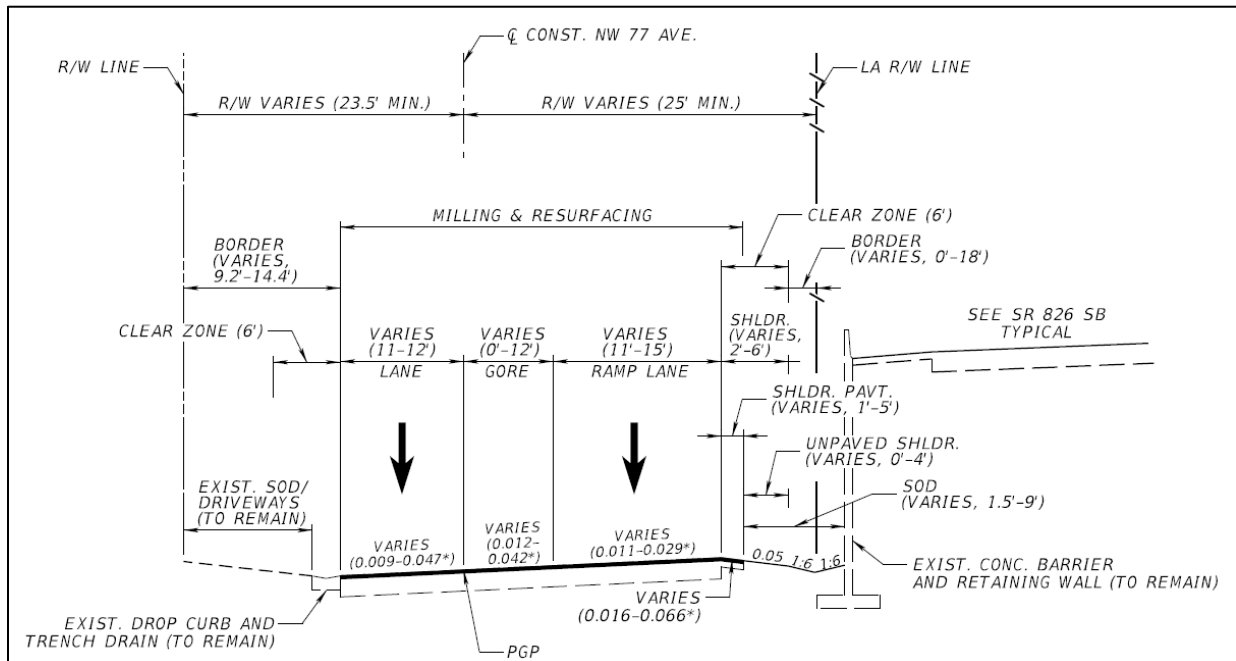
Proposed Frontage Road (One-Way) – Typical Section 6 (West Frontage Road/NW 77th Avenue)
